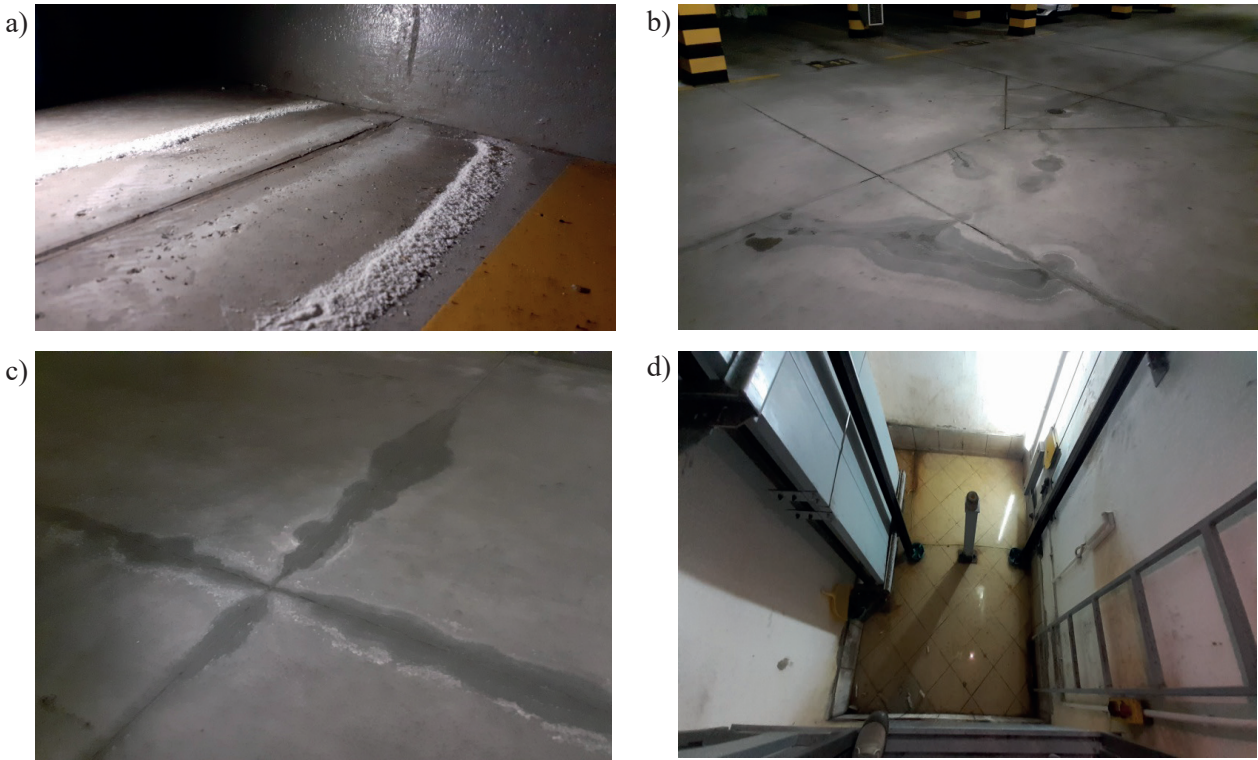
Leaks through (a, b, c) floor / foundation slab, (b) lift shaft
